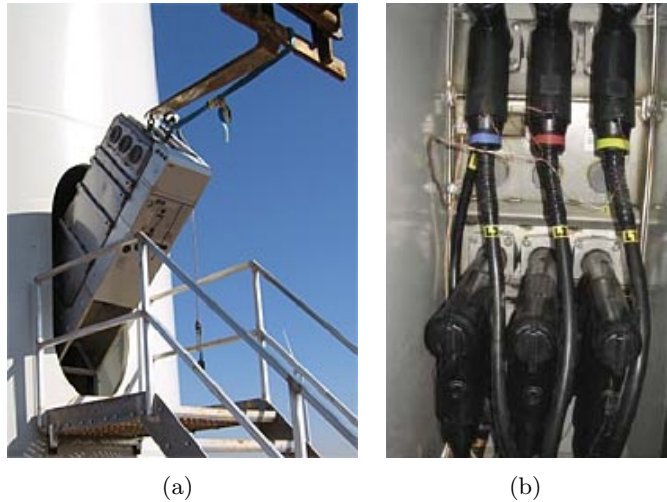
(a) Switchgear slim enough to fit through a tower door [73]. (b) Switchgear installed inside a wind turbine tower [74].
